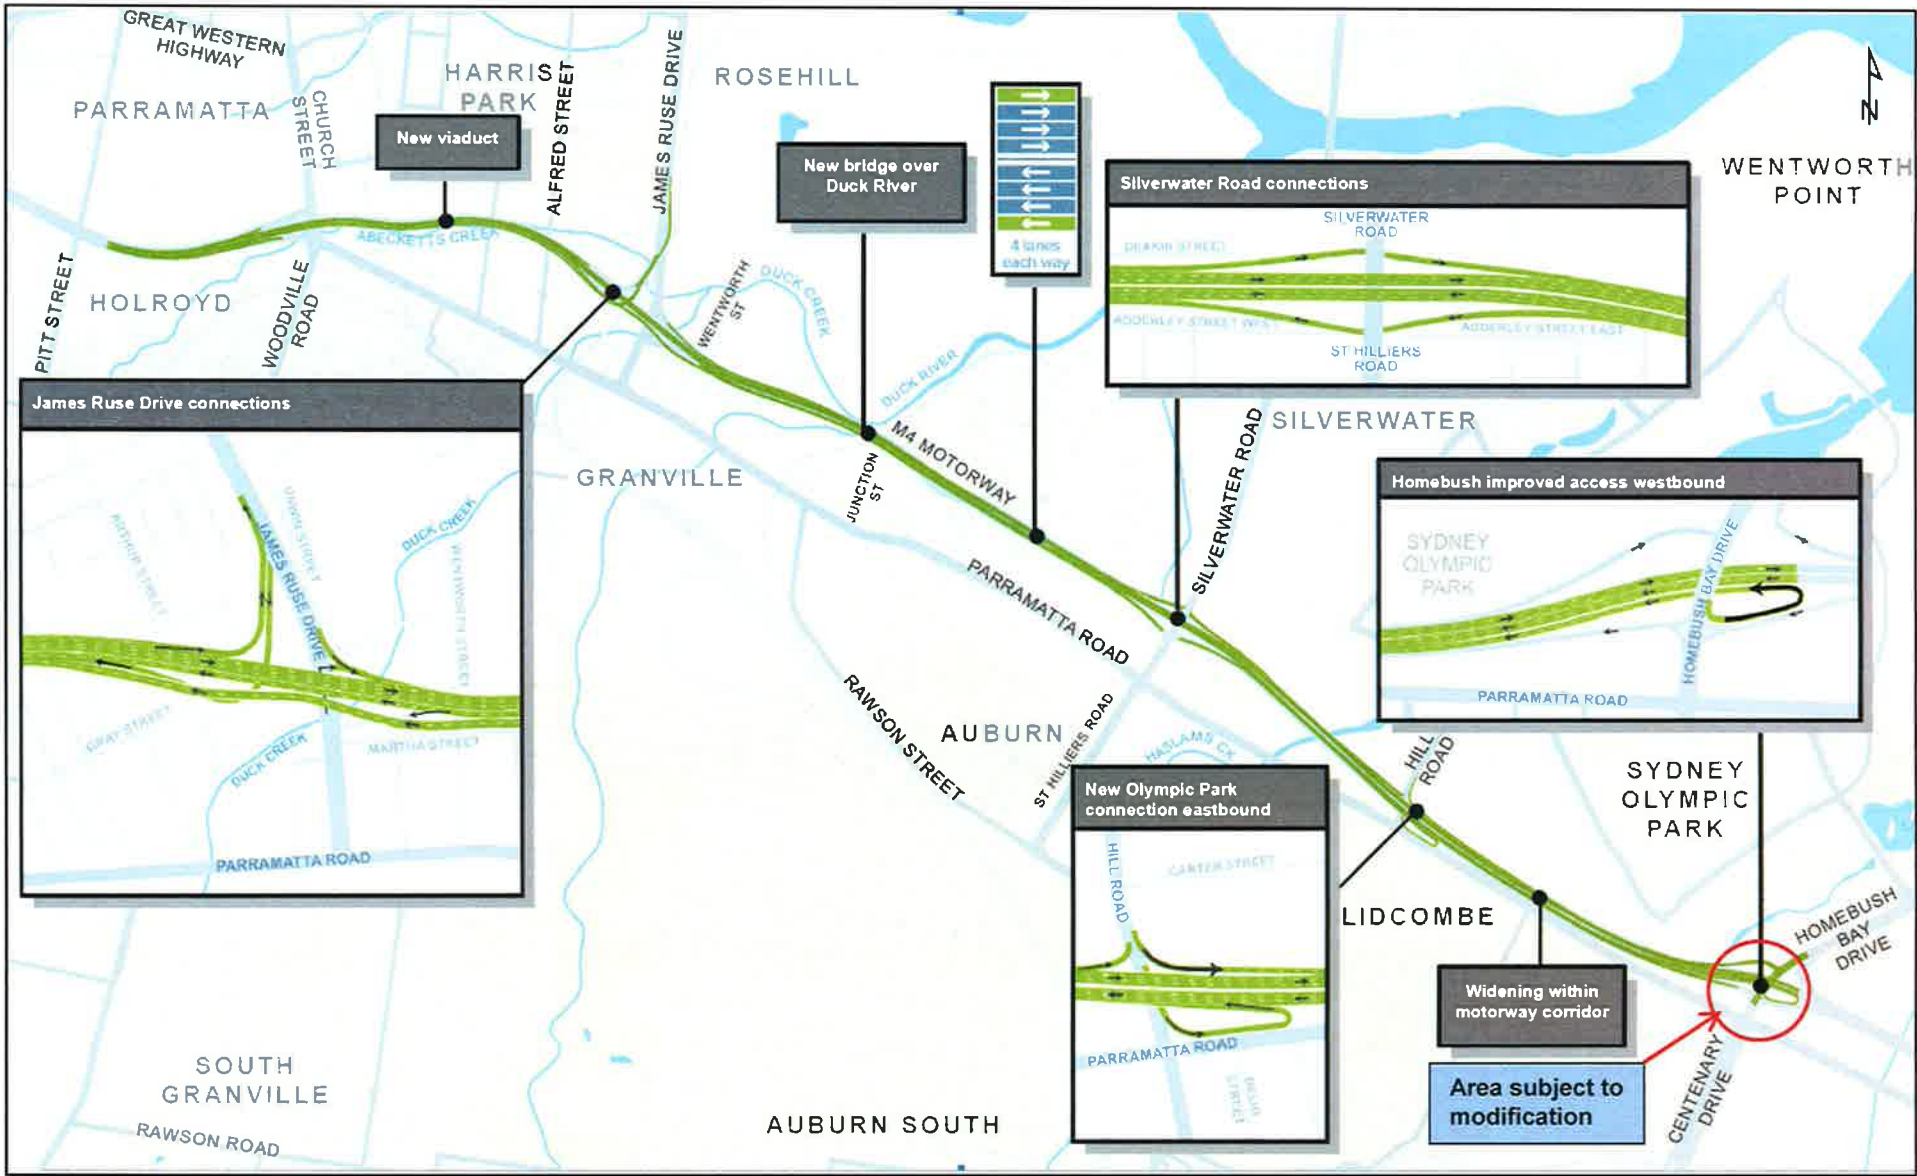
M4 Widening Project Alignment and Location of Proposed Modification (Source: Proponent's Modification Report)
